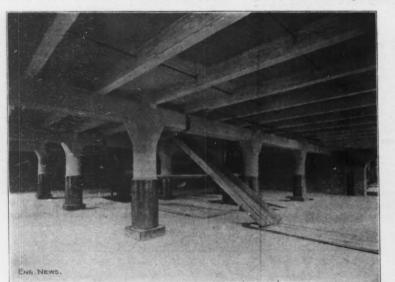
INTERIOR VIEW OF THE NEW YORK SUGAR REFINING CO.'S NEW REFINERY, SHOWING FIREPROOF FLOORS AND COLUMN AND BEAM FIREPROOFING.
